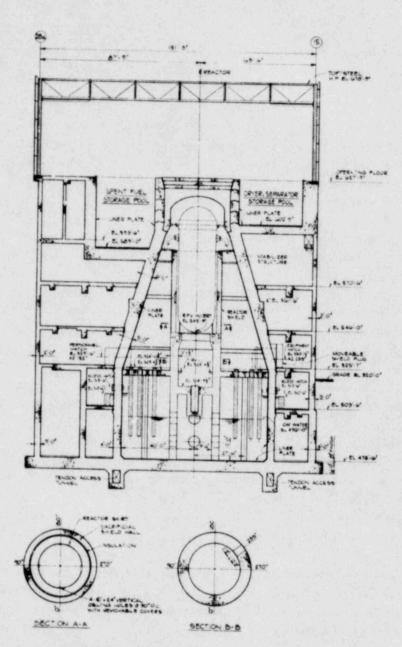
ZIMMER PRIMARY AND SECONDARY CONCRETE CONTAINMENT STRUCTURES
